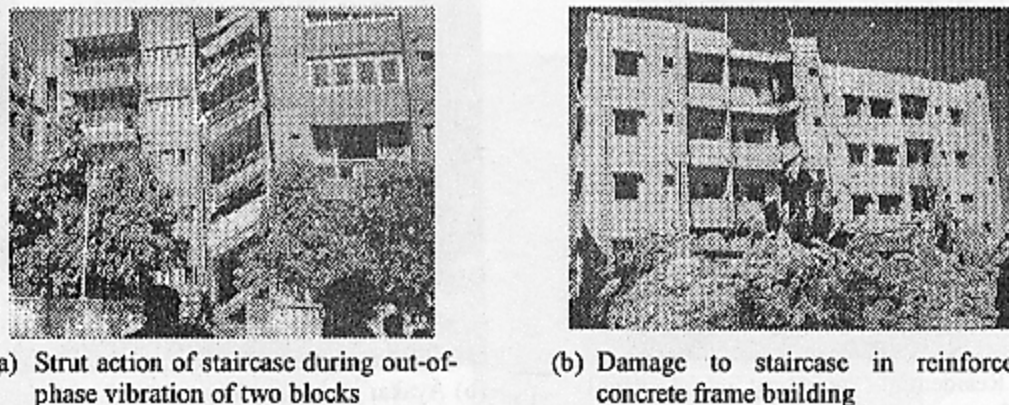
Failure of staircase in reinforced concrete framed buildings
